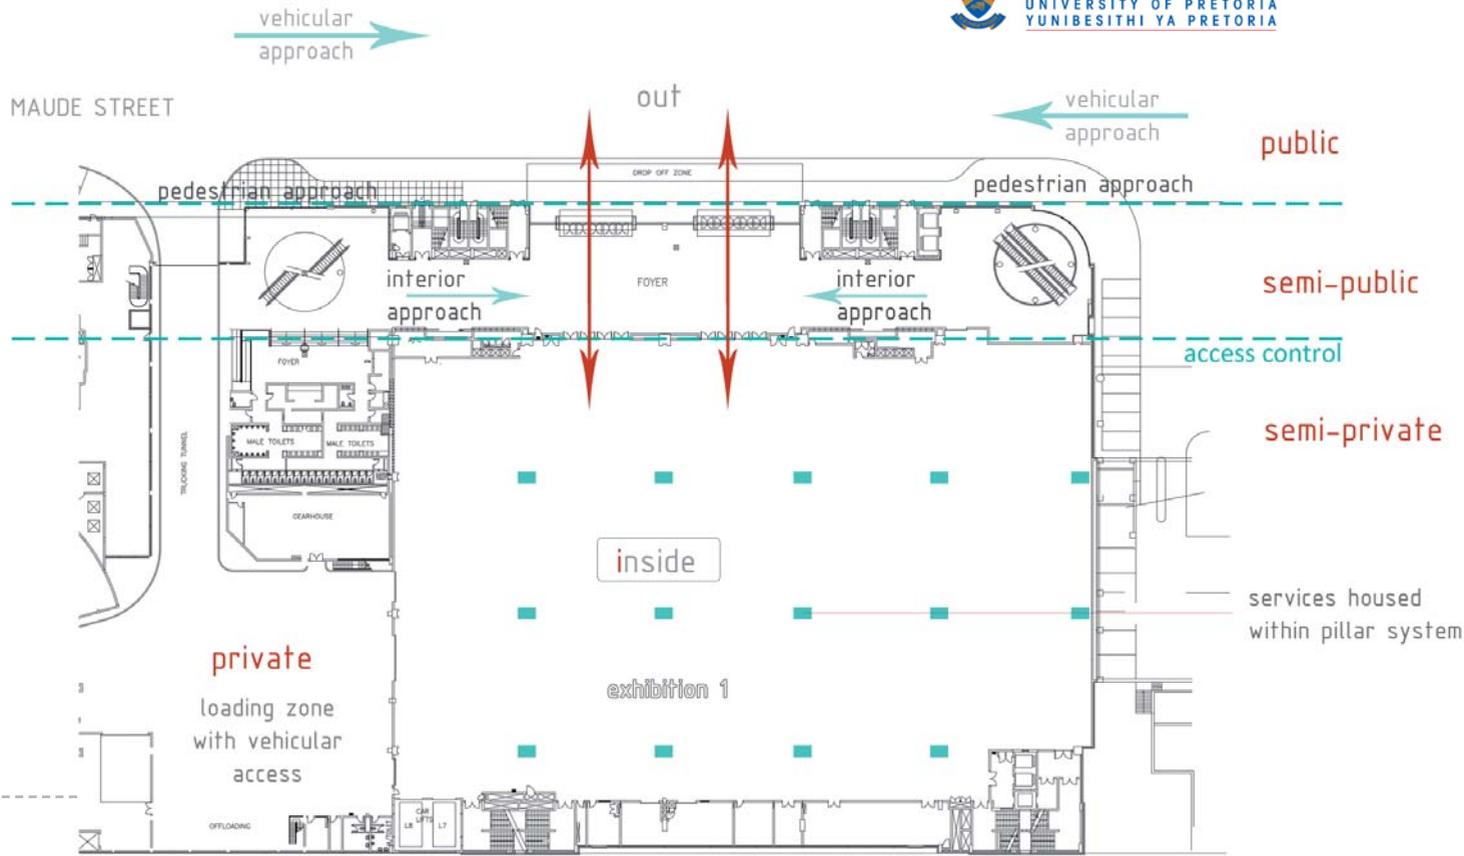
Exhibition 1 floor plan, Sandton Convention Centre: LKA (1998)
